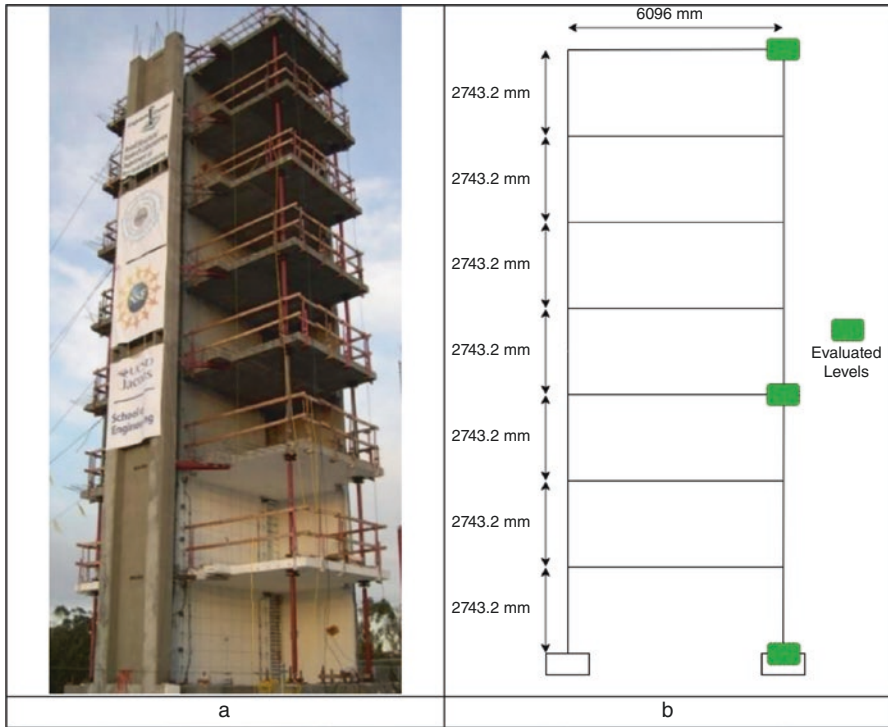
(a) View of the full-scale specimen from side and (b) dimensions of the full-scale specimen
